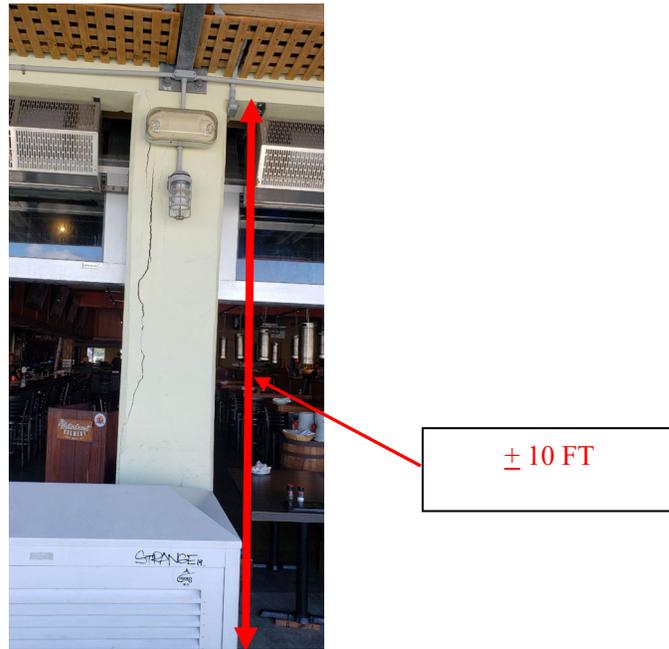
Location 26: Approximately 10 ft long new 16x12 concrete column.
